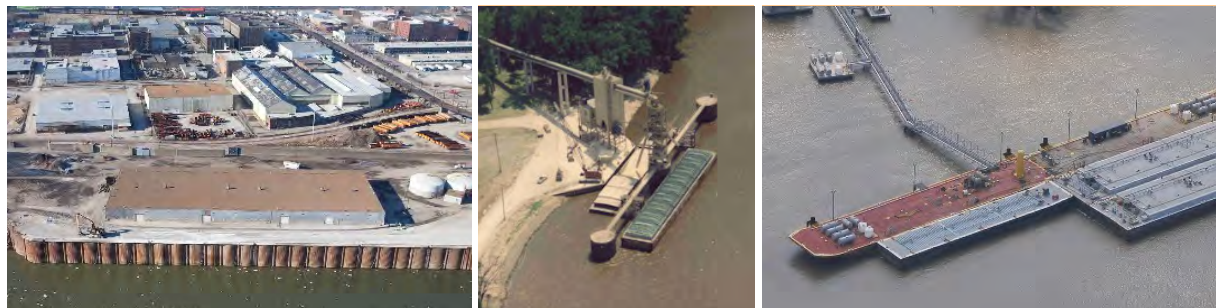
Dock Types: (Left to right) Sheet pile-fixed, caisson type, floating dock with shore ramp. (IAMPE Photos)
